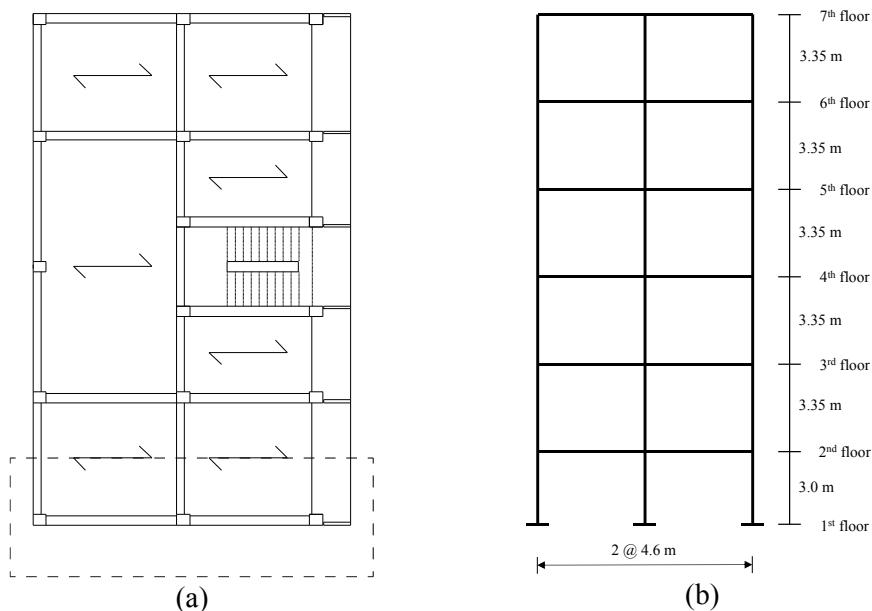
Floor plant (a) and sketch of the Italian building transversal frame (b).
